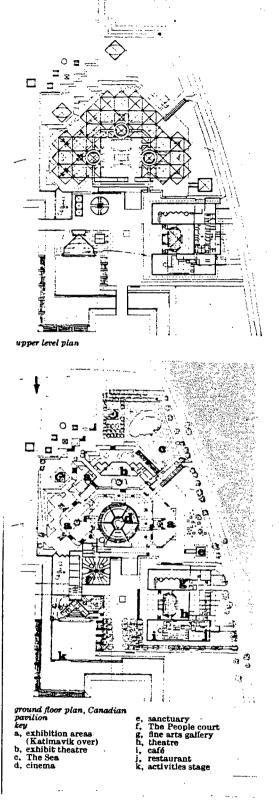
Ground Floor Plan, Canadian Pavilion, Expo 67 [source: Architectural Review, August 1967]
